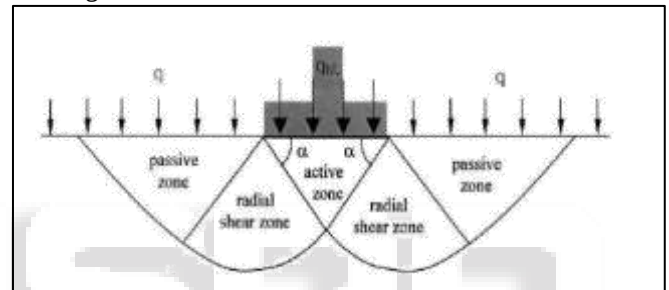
Typical Failure Mechanism of Axially Loaded Footing
